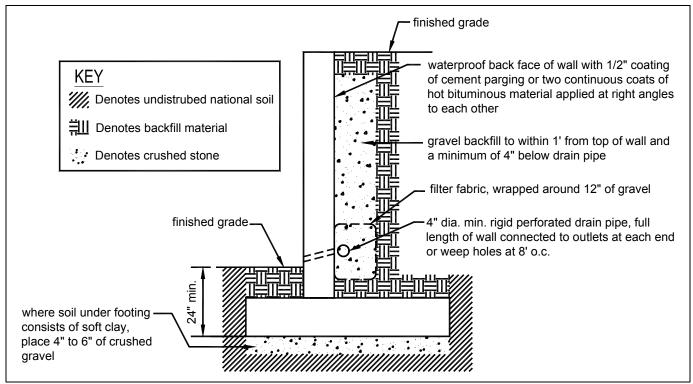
TYPICAL BACKFILL AND DRAINAGE DETAIL
